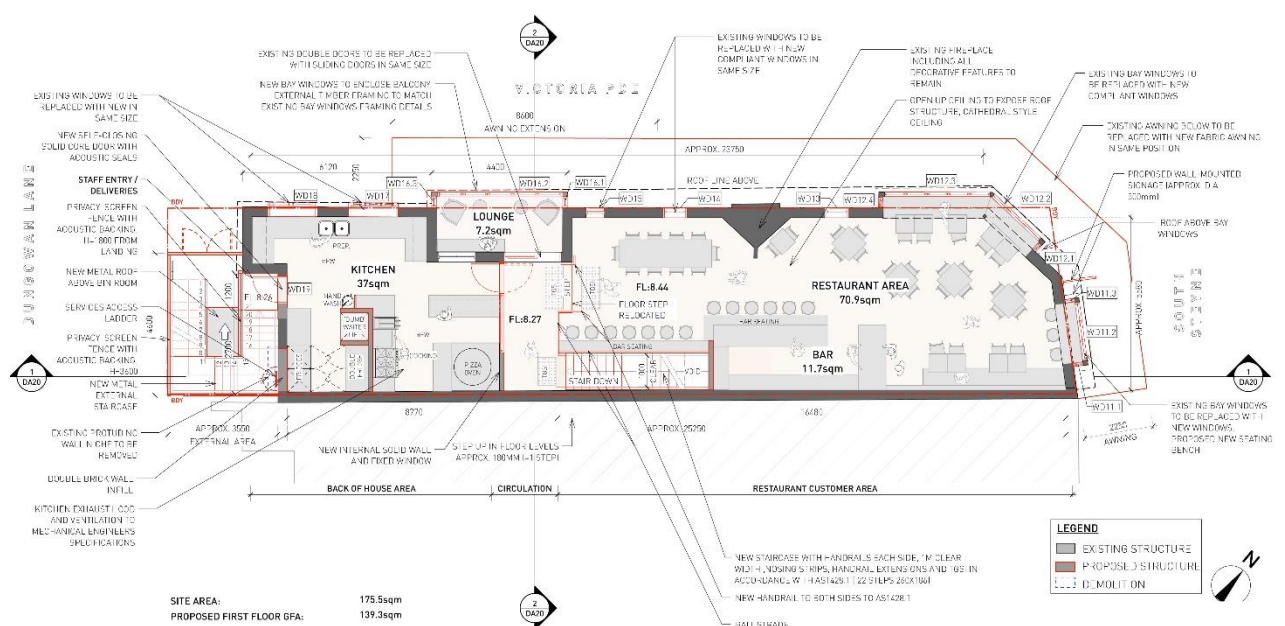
Proposed alterations and uses to the First Floor. See Drawing DA11
